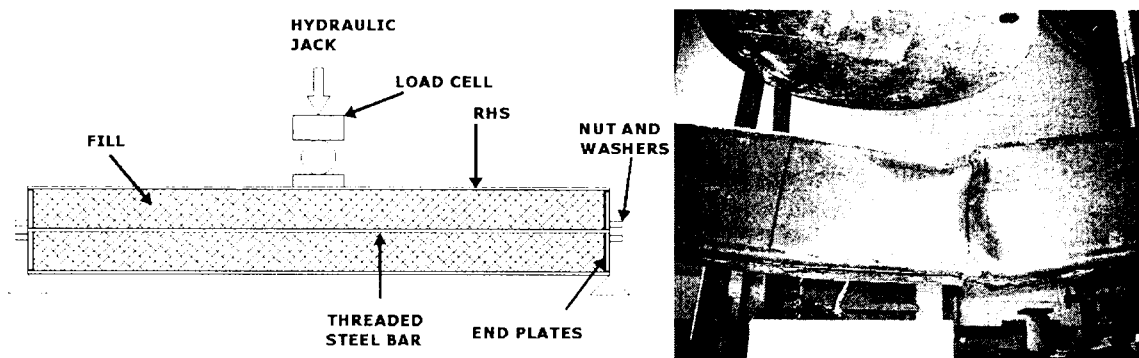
a) Testing set up and b) failure of a rectangular hollow section with confined gravel (Darby 2001)
